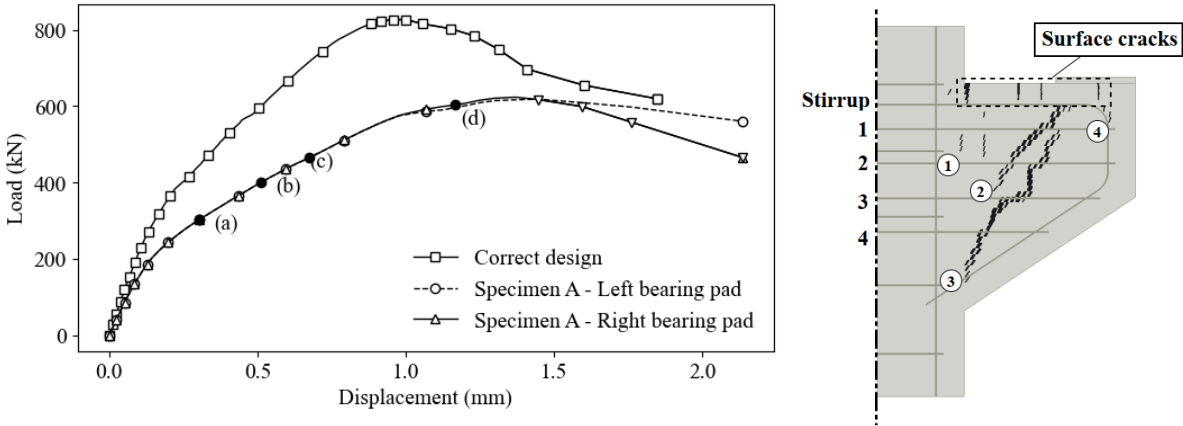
Load-displacement diagram and crack model at an applied load of 623 kN, minimum crack width of 0.01 mm.
